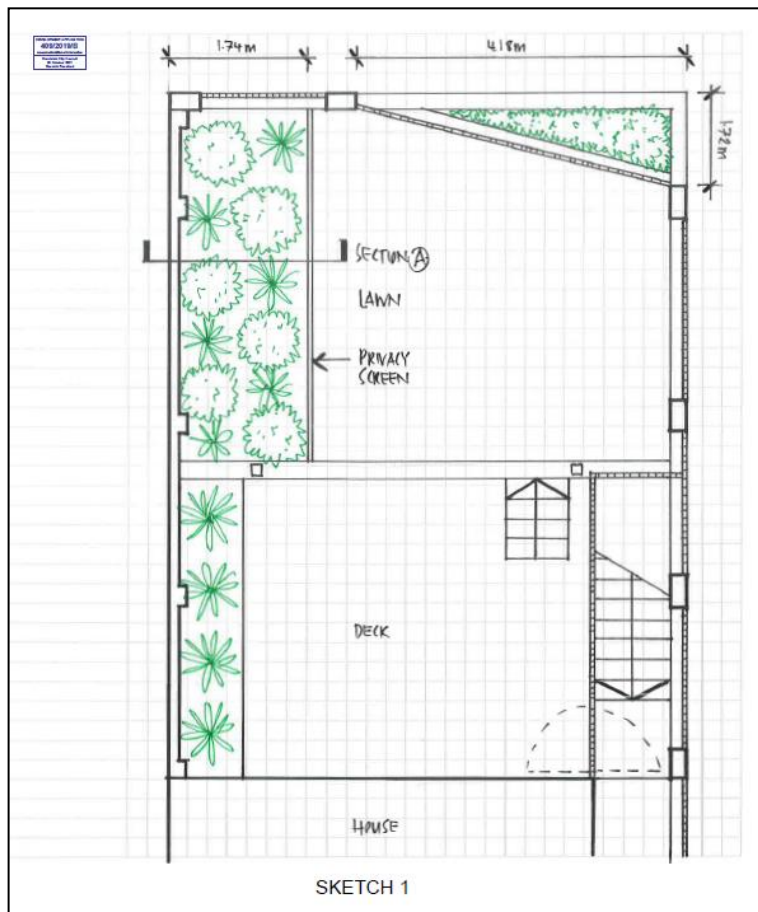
Drawing SK-001 – 2 Barrett Place, Randwick (Source: K Burke, 26/10/2021)
